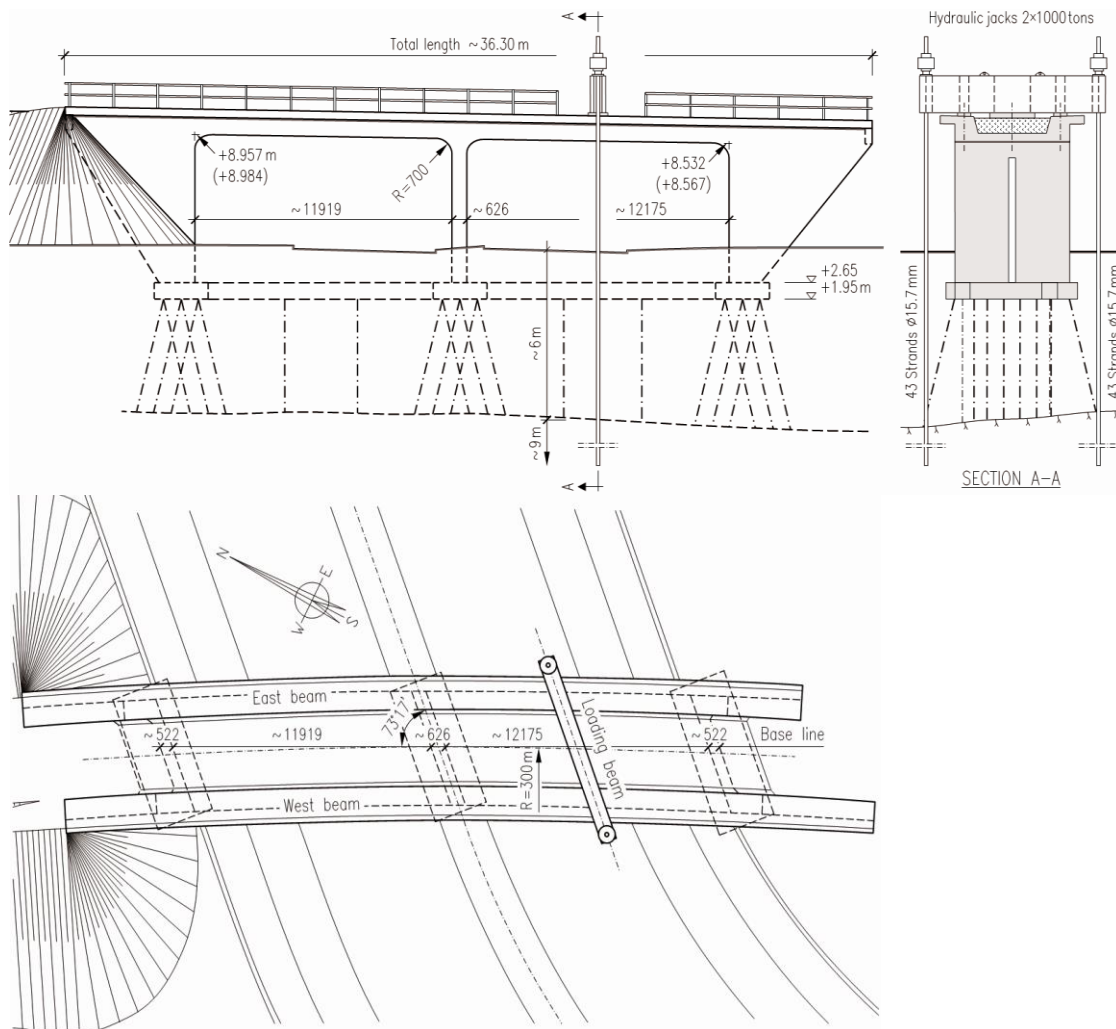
Elevation, section and plan of the bridge together with the loading arrangement [mm]. Each of the two spans had a length of about 12 m (39 ft) and a width of 6 m (20 ft). The South landfill was removed before the test. A steel beam was placed in the middle of one of the two spans and was pulled downwards. (Elfgrén et al., 2008).
